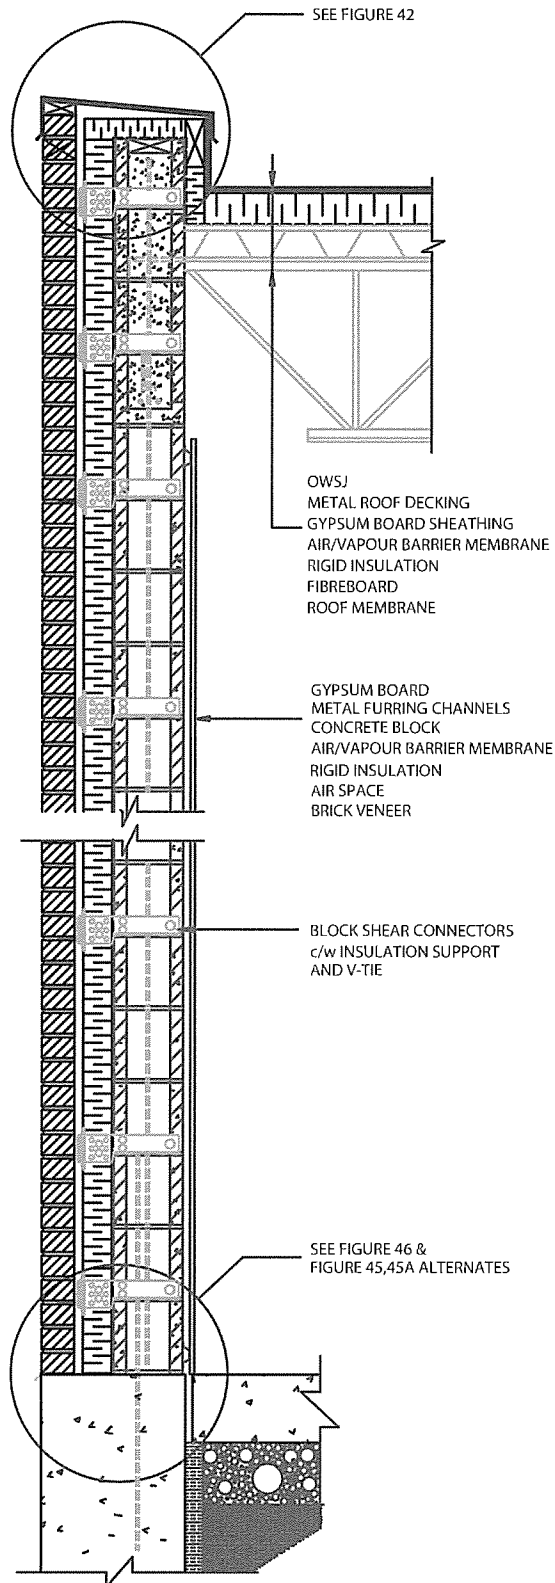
BRICK VENEER / CONCRETE BLOCK - O.W.S.J. CONNECTION
